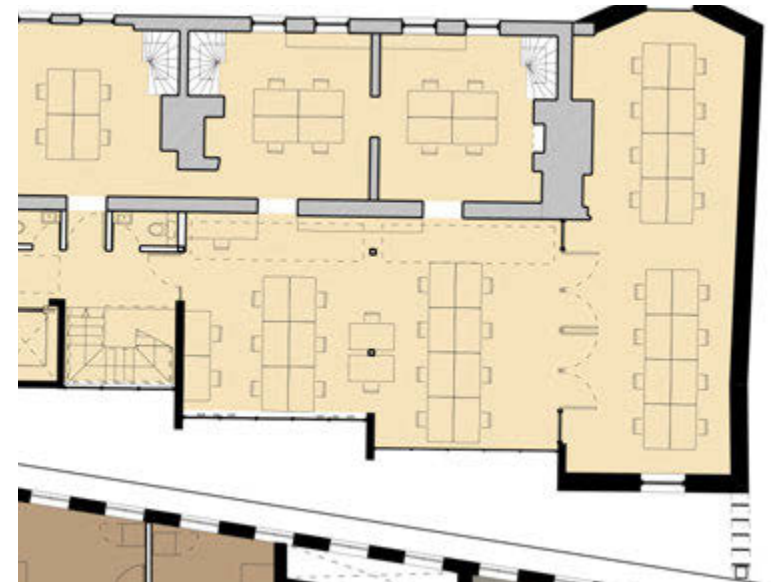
Weavers Cottages - Proposed Second floor plan
